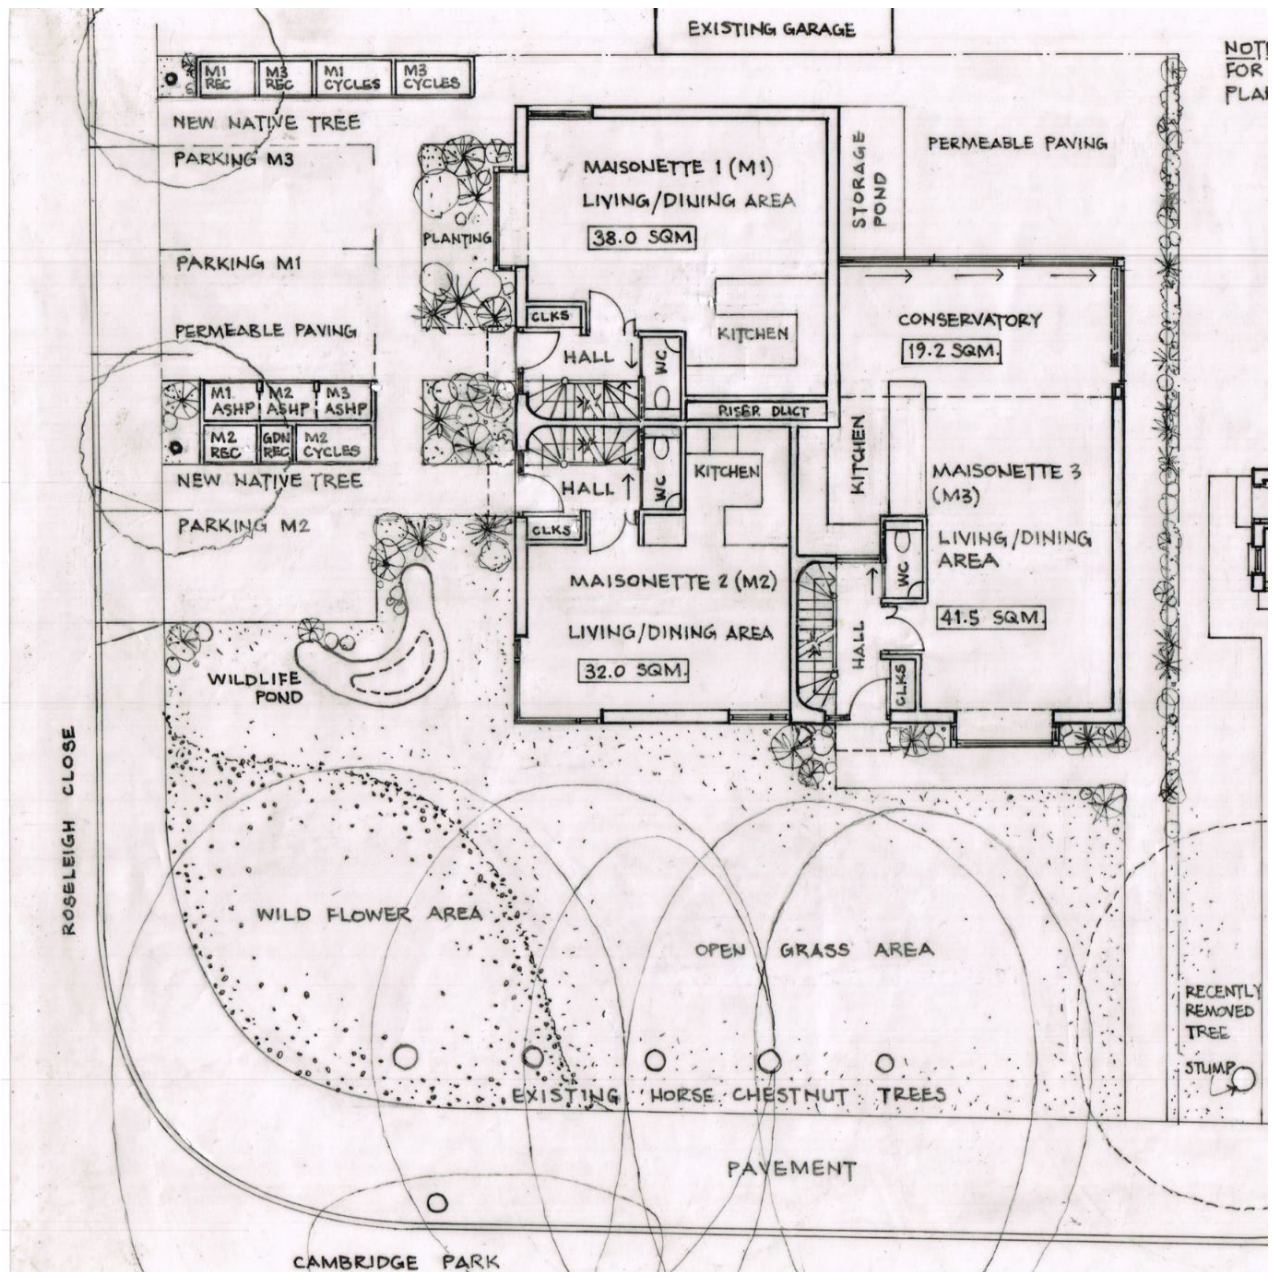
Proposed Ground Floor and Site Layout (Deon Lombard Architects)
